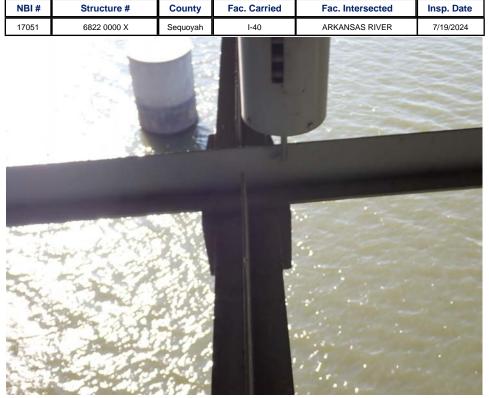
Looking north at span 6, girder 4, near floor beam 3. Note: no change to the 1 1/4-inch-long crack.
